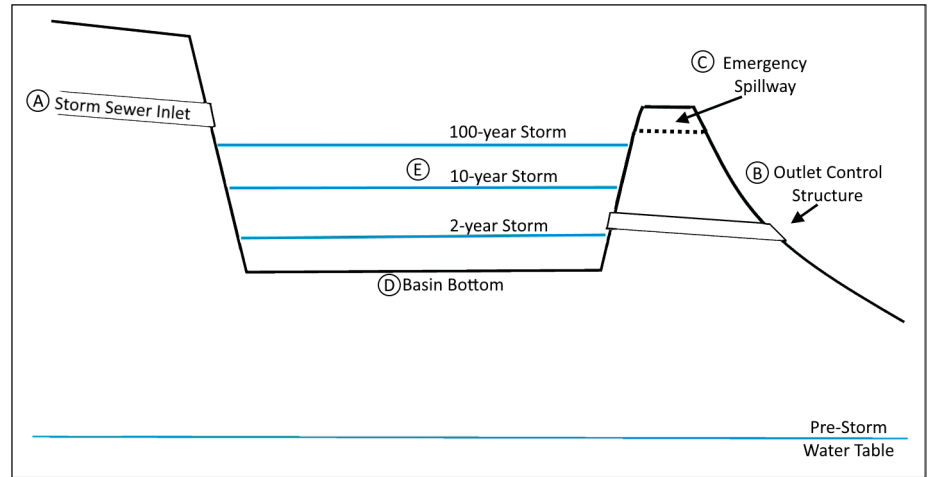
Schematic Detention Basin Cross Section showing components. A) Inlet pipe from stormwater sewer system. B) Outlet Control Structure which causes restricted flow from the basin. C) Emergency spillway for storms that exceed capacity of basin storage. D) Basin bottom through which Infiltration to the aquifer occurs. E) Initial water levels after the end of two, 10 and 100-year storms.
